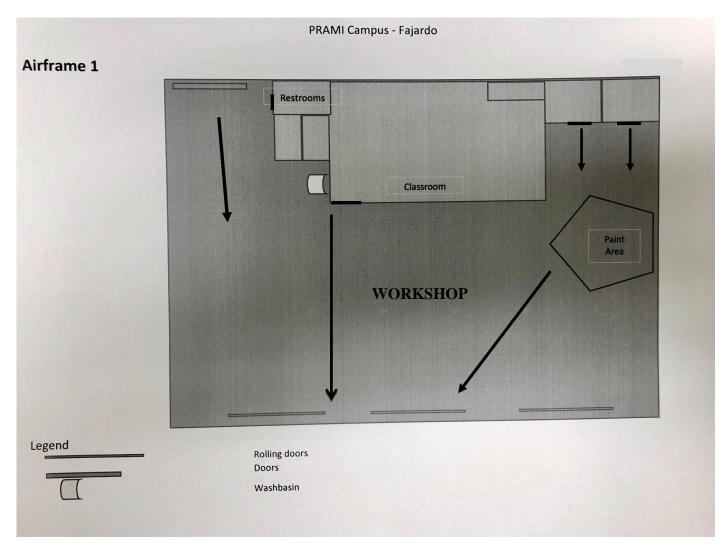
Emergency Exit Plan, Building D-2, First floor Airframe Classroom (D - 104)
